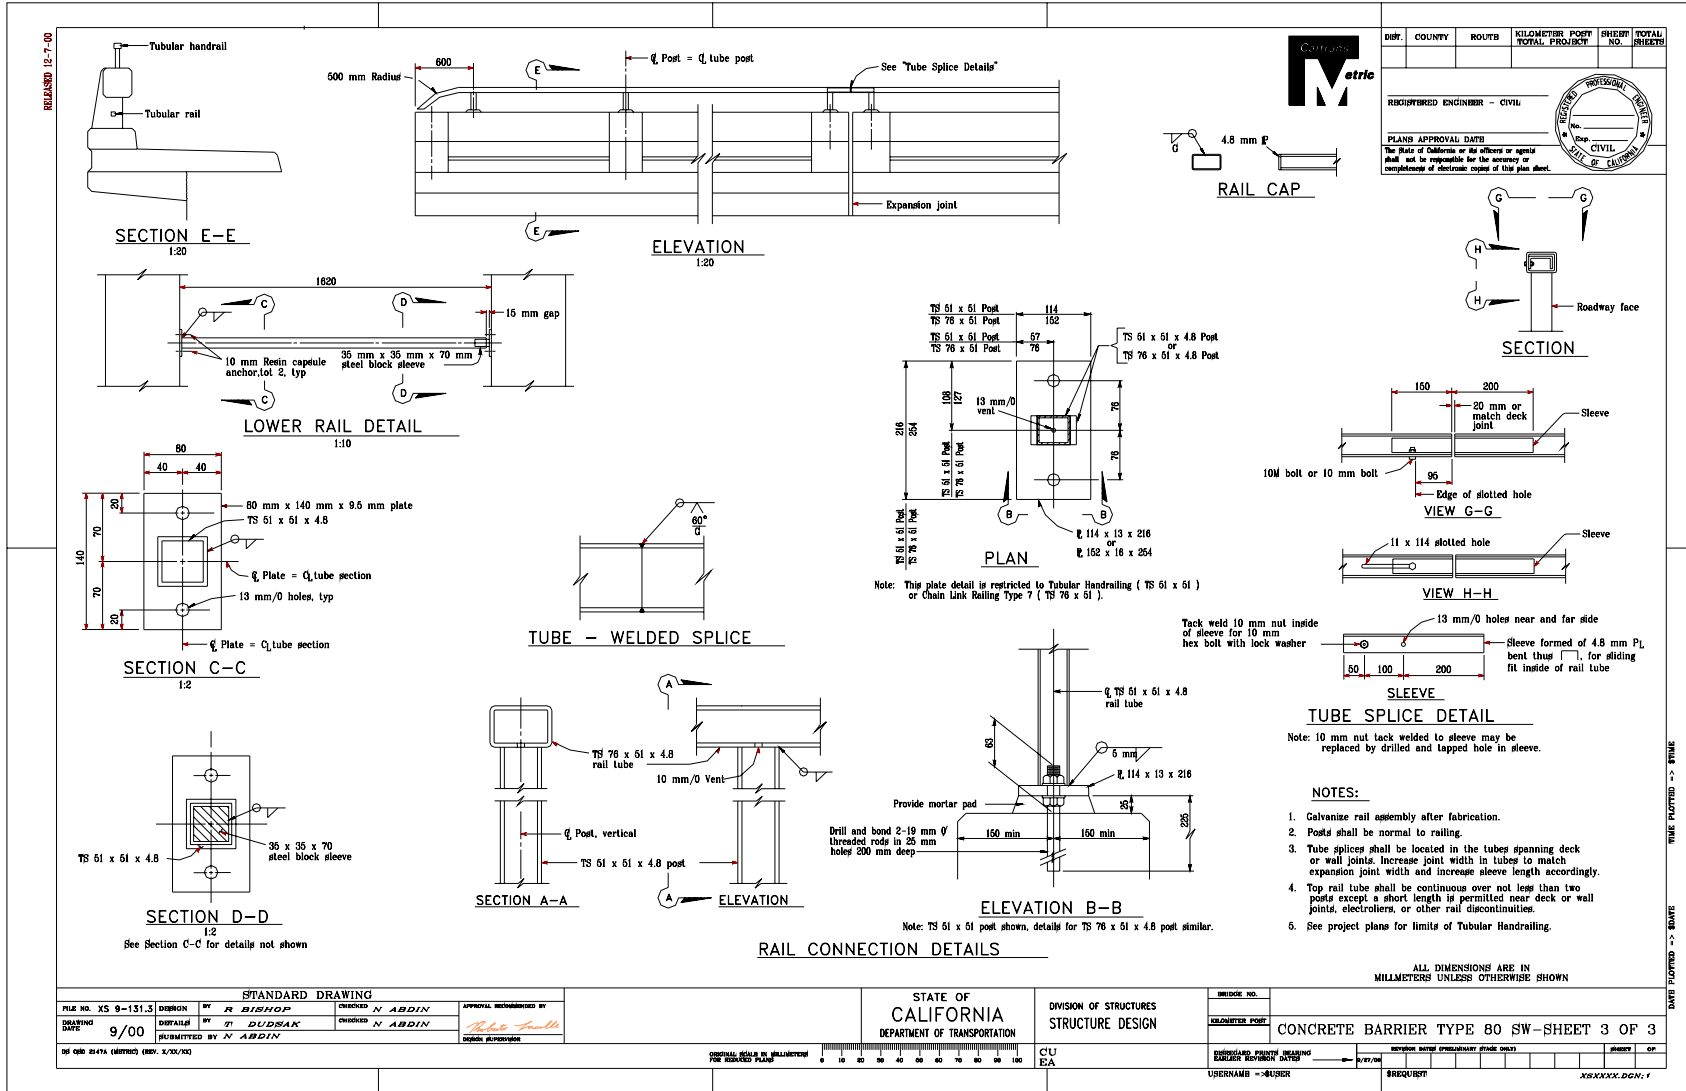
Details of Type 80SW Bridge Rail with Sidewalk.
